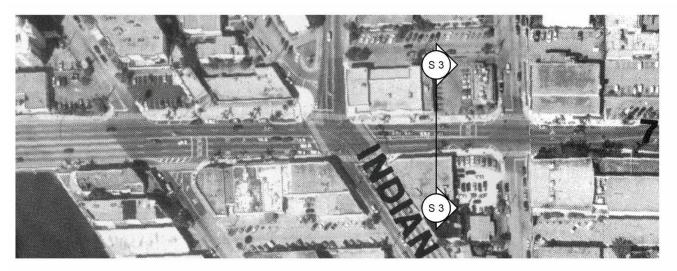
Existing Cross-section - SR 934/71st Street at Byron Avenue
